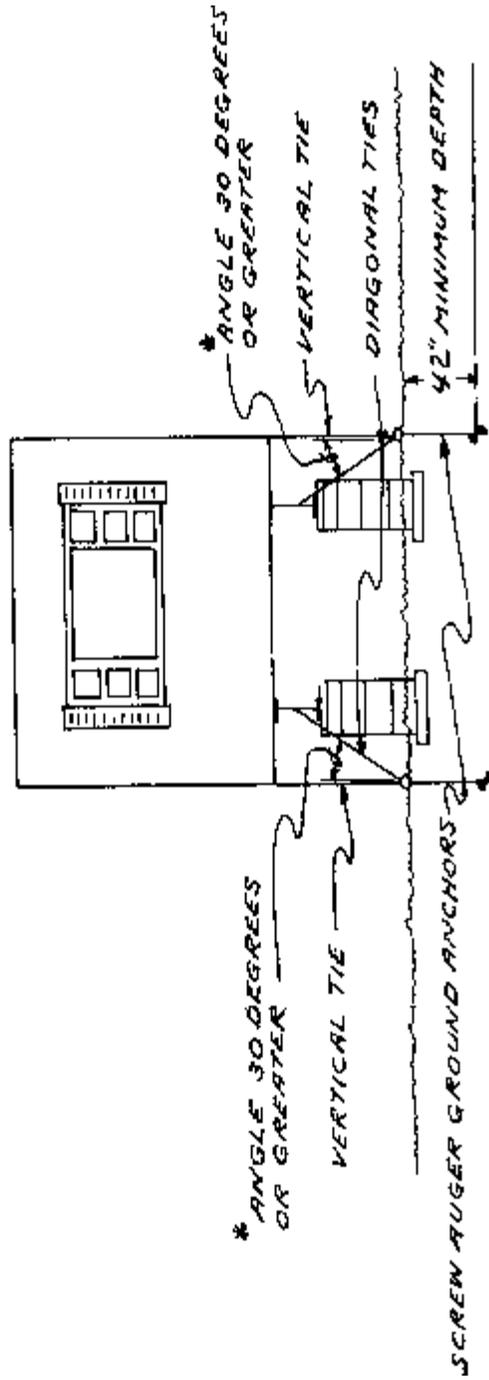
PIERS OVER 80" IN HEIGHT (DOUBLE BLOCK CONSTRUCTION, STEEL REINFORCED)
